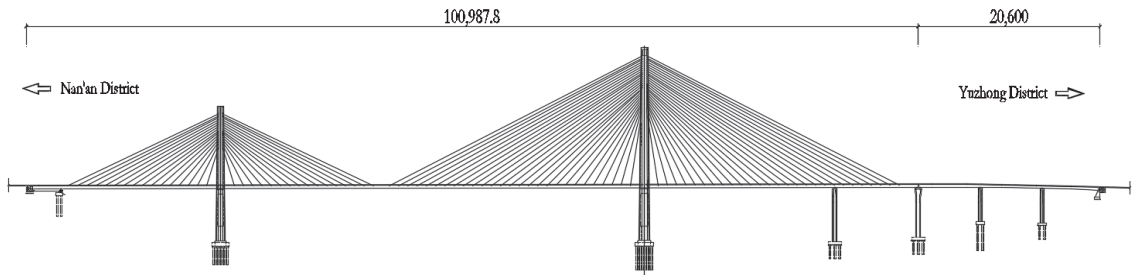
The bridge type layout of Nanjimen Yangtze River Track Special Bridge (unit: mm).
